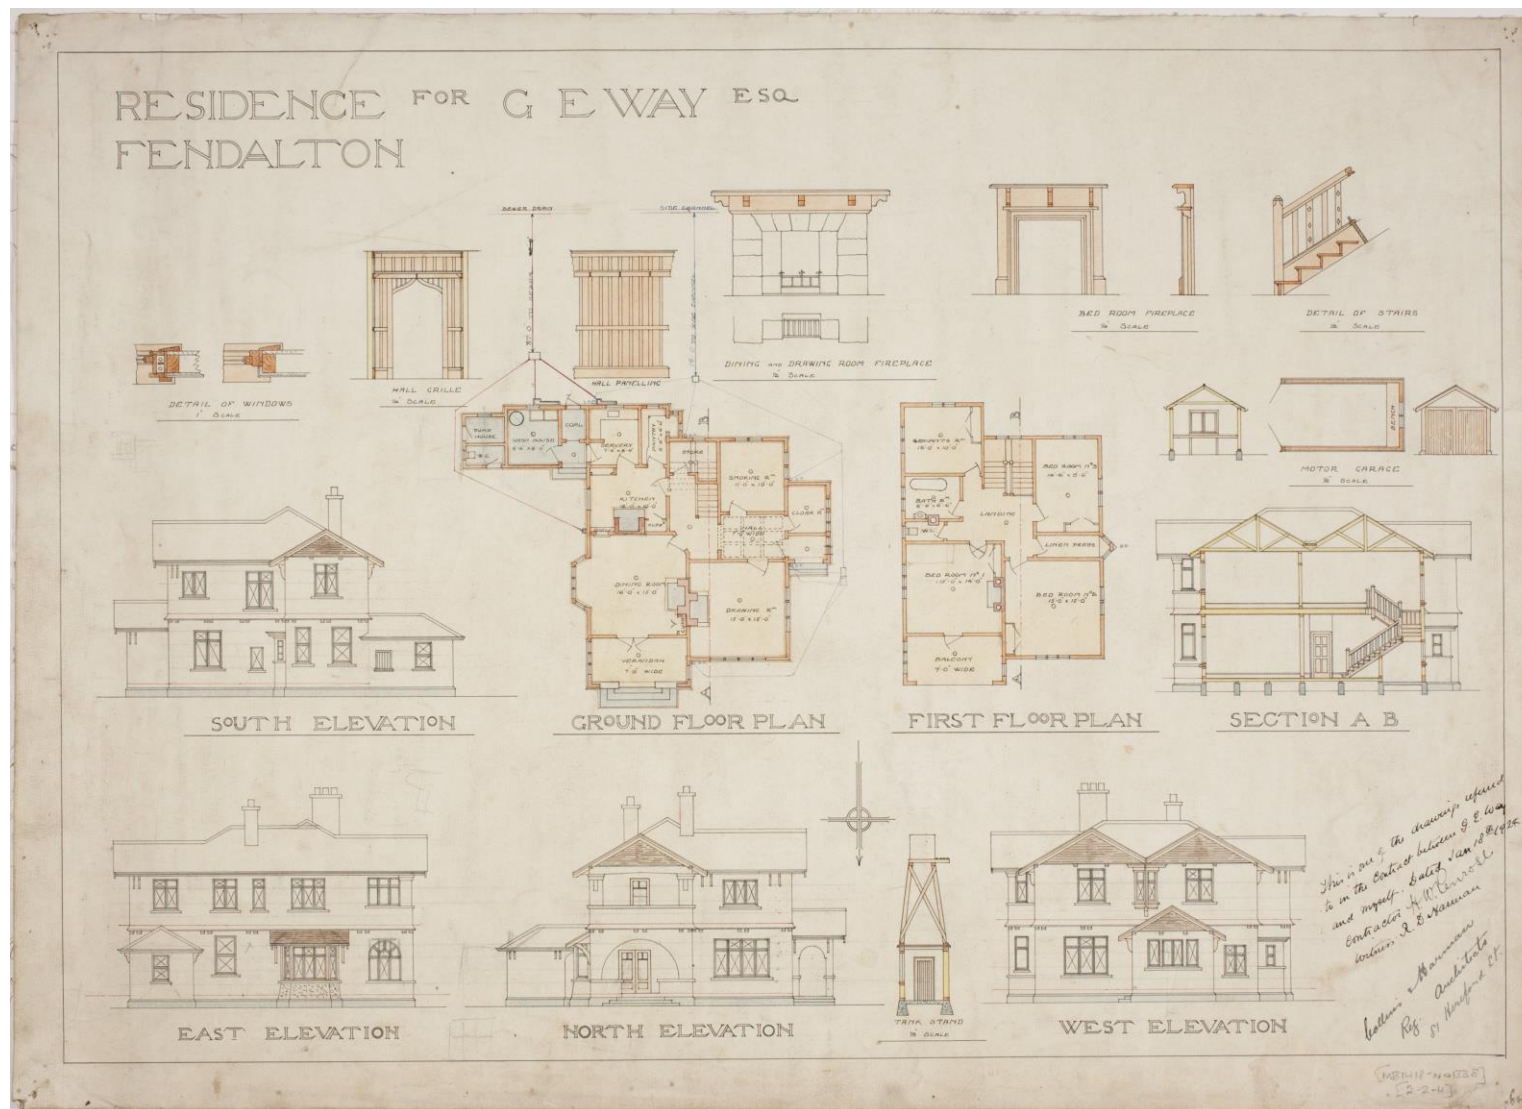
Collins and Harman, Residence for G. E. Way, Esq., Fendalton, plans, elevations, sections and details (1924).
